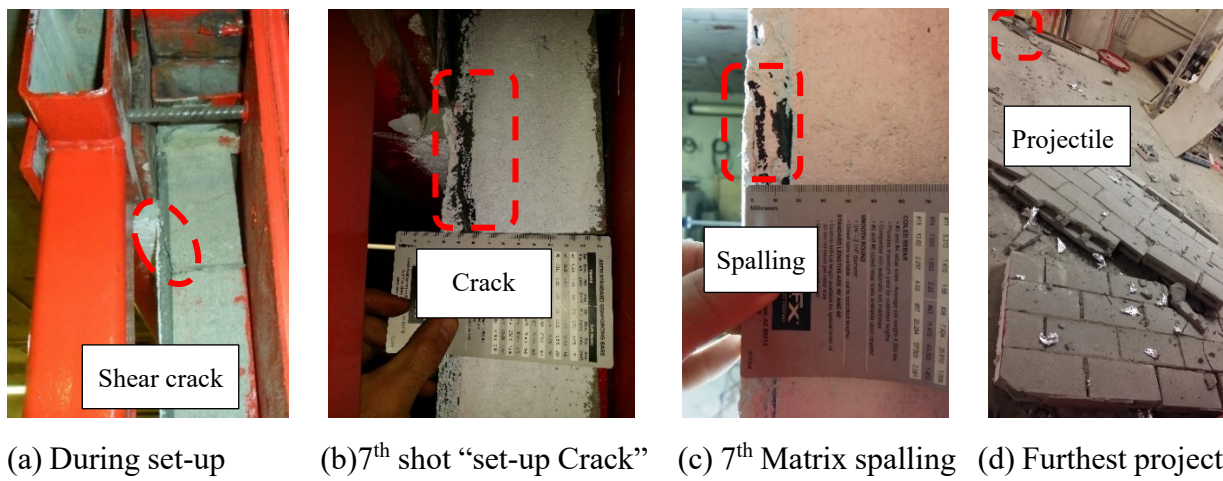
Major shear cracks and other details (RCL-NC-1)
